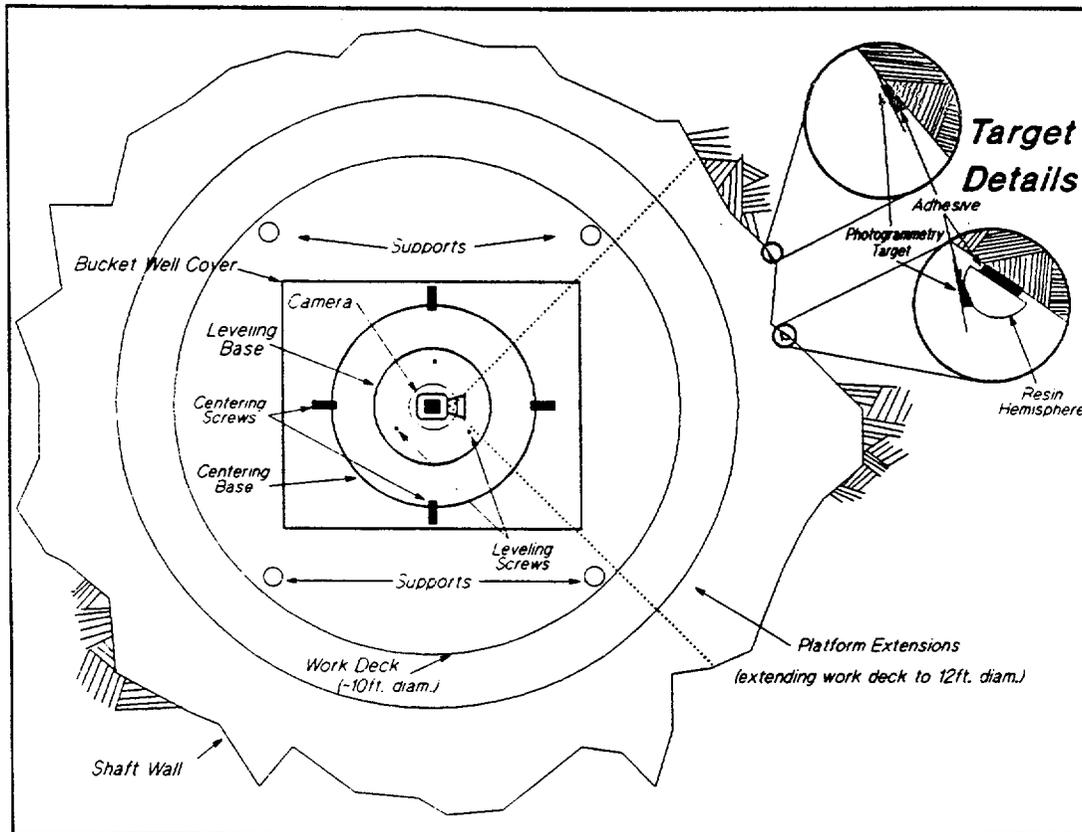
Diagrammatic Plan View of the lower galloway deck with detail showing photogrammetry target placement.
